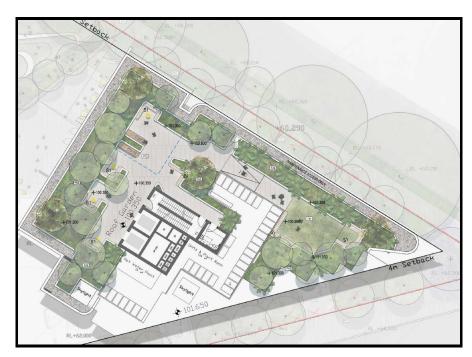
Rooftop communal open space - Building C (Source: Landscape Plans March 2023)
